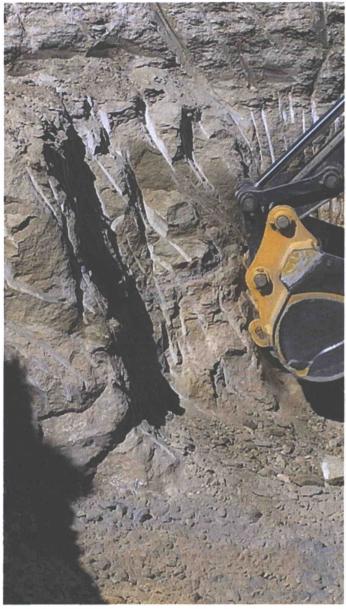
Krause WN Federal 2 Excavator Teeth Marks in Western Wall.
